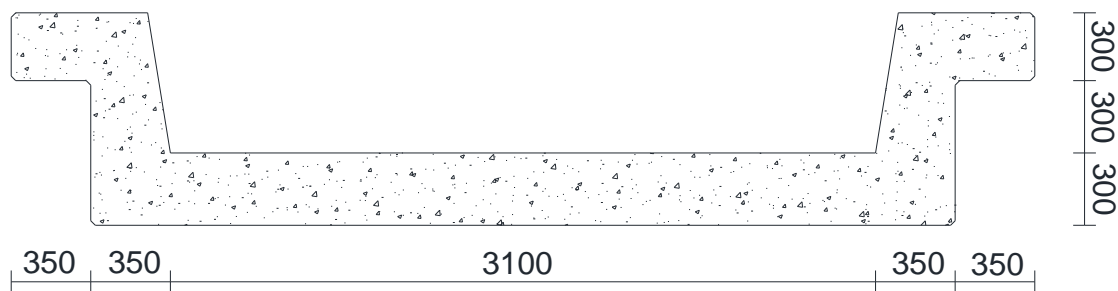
Cross section and dimensions of the B2447-2 trough bridge.
